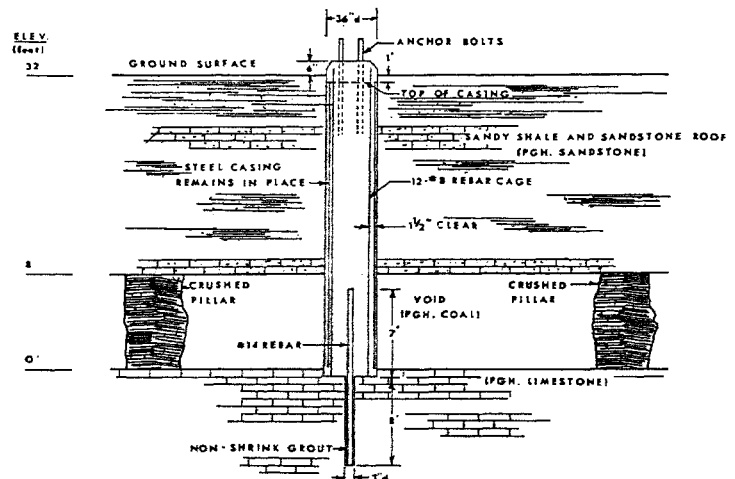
TYPICAL SECTION OF CAISSON THRU MINE
